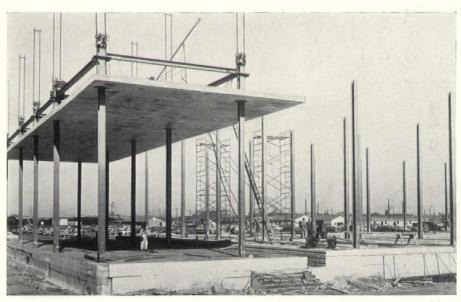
First slab on way to top. Note hydraulic jack mechanism, lifting rods and temporary steel bracing at top of columns
